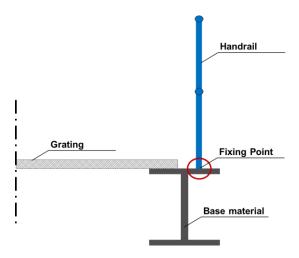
Schematic representation of a handrail application on a steel base material (section view).
